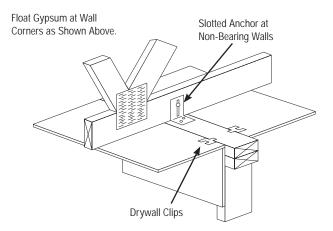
Use of Drywall Clips and Slotted Anchor on Non-Bearing Wall
